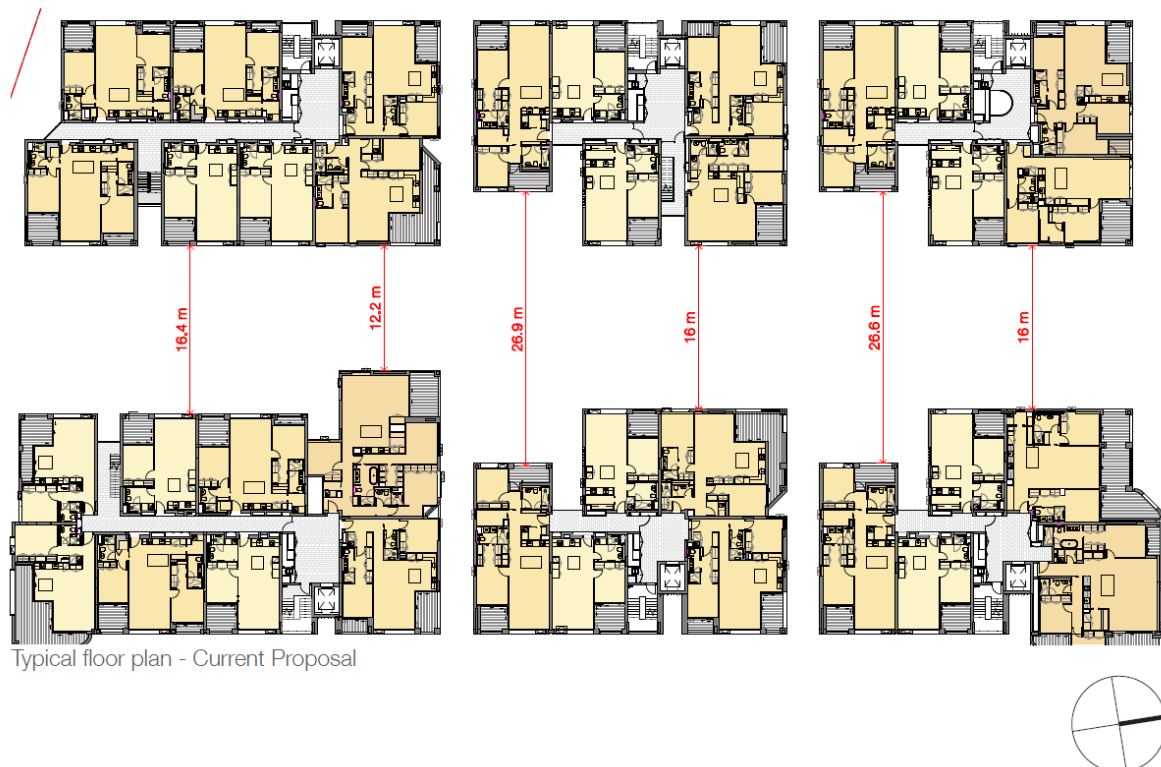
Typical lower floor level within the development depicting separation distances between buildings.
